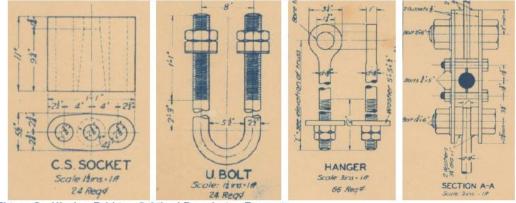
Kindee Bridge - Original Drawings - Excerpts
